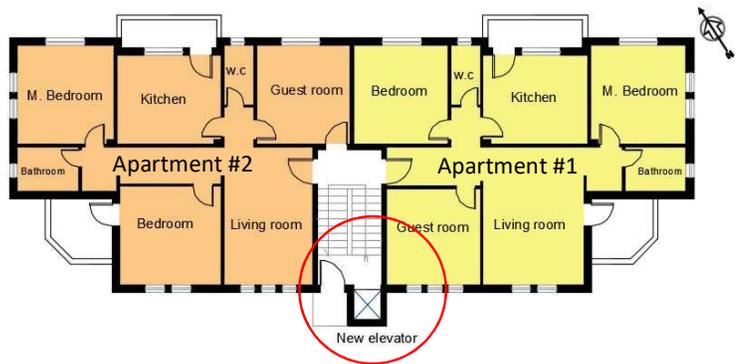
Represents the typical plan of the case study building type 1 after adding an elevator.
